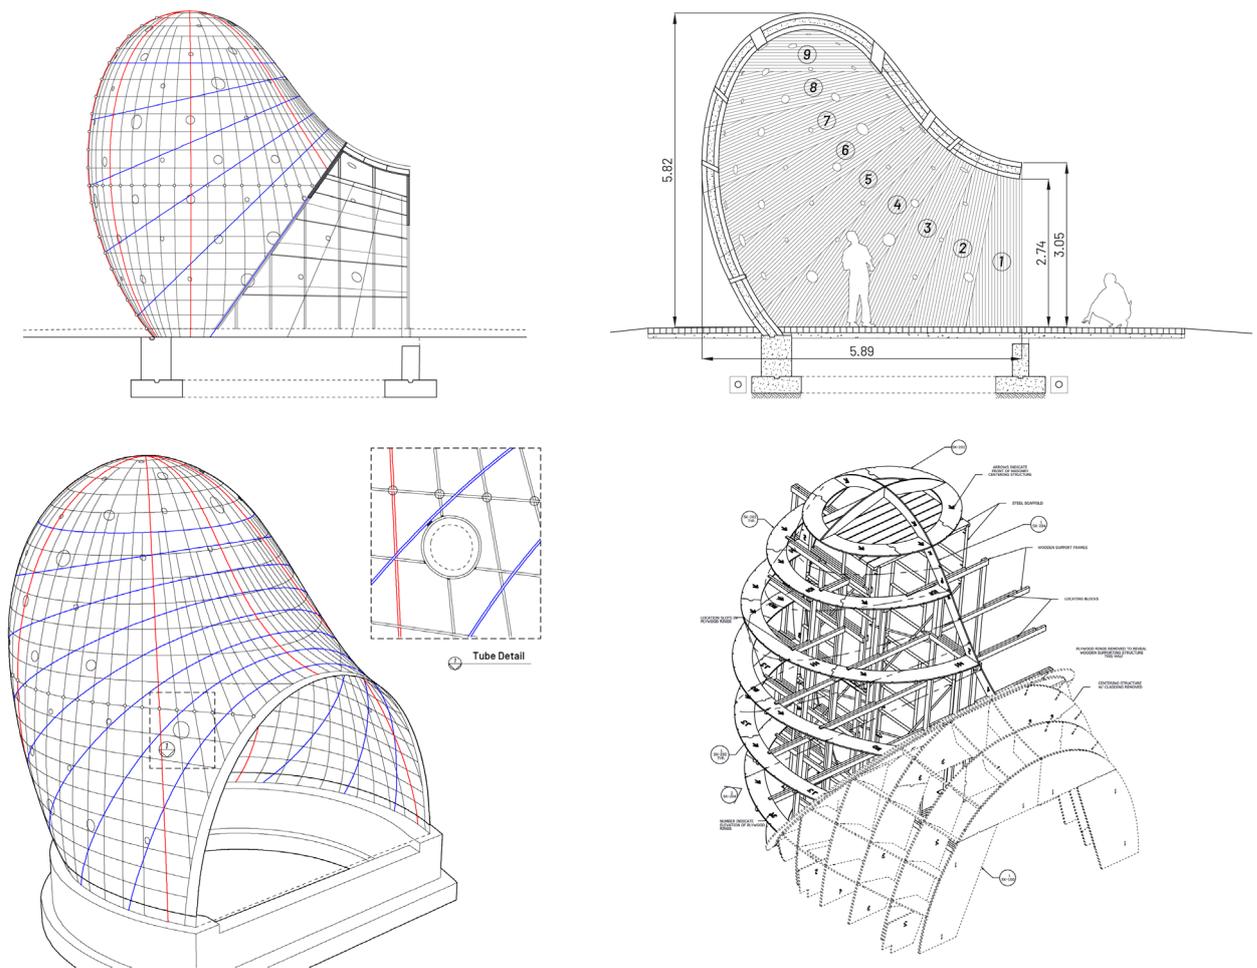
a. Cross section of guidework; b. Cross section of masonry showing the nine segments; c. Stainless steel reinforcement; d. Wooden formwork. [Lara Davis and KC Fabrications]
